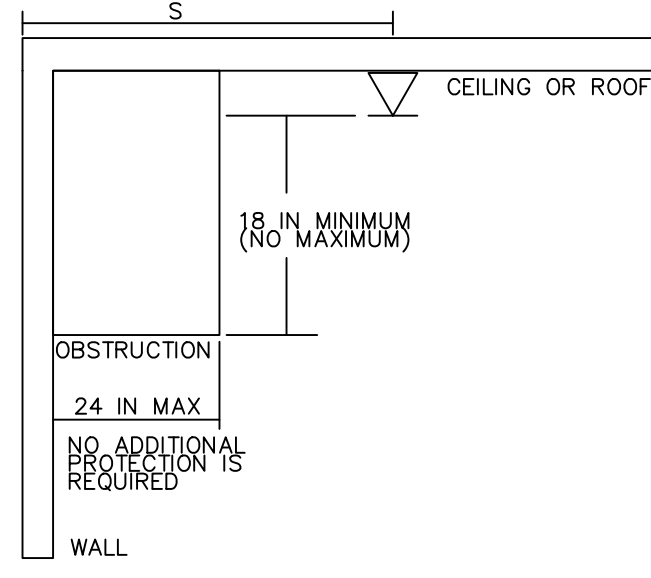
(C) OBSTRUCTIONS AGAINST WALL (MEASUREMENTS FOR RESIDENTIAL UPRIGHT AND PENDENT SPRAY SPRINKLERS)
